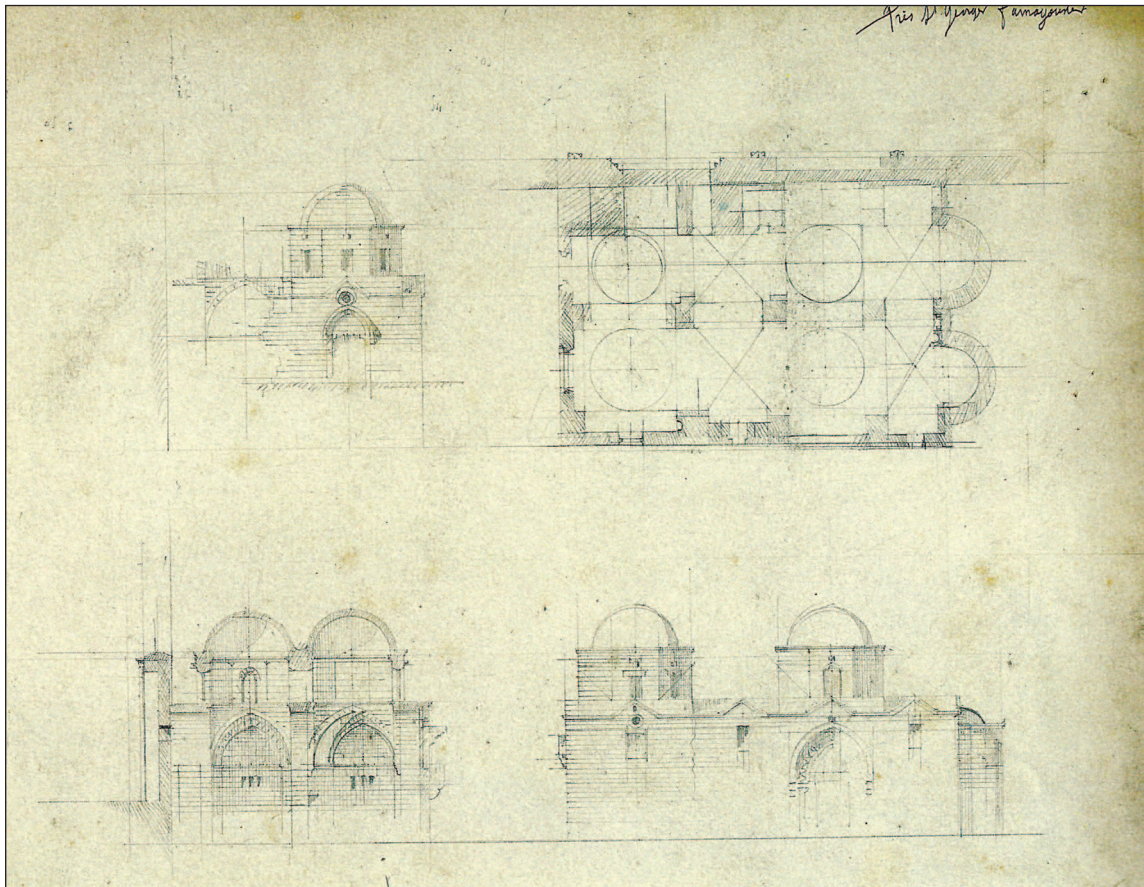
Hagios Epiphаний, Elevations, Section and Plan, c. 1860 – Edmond Duthoit
